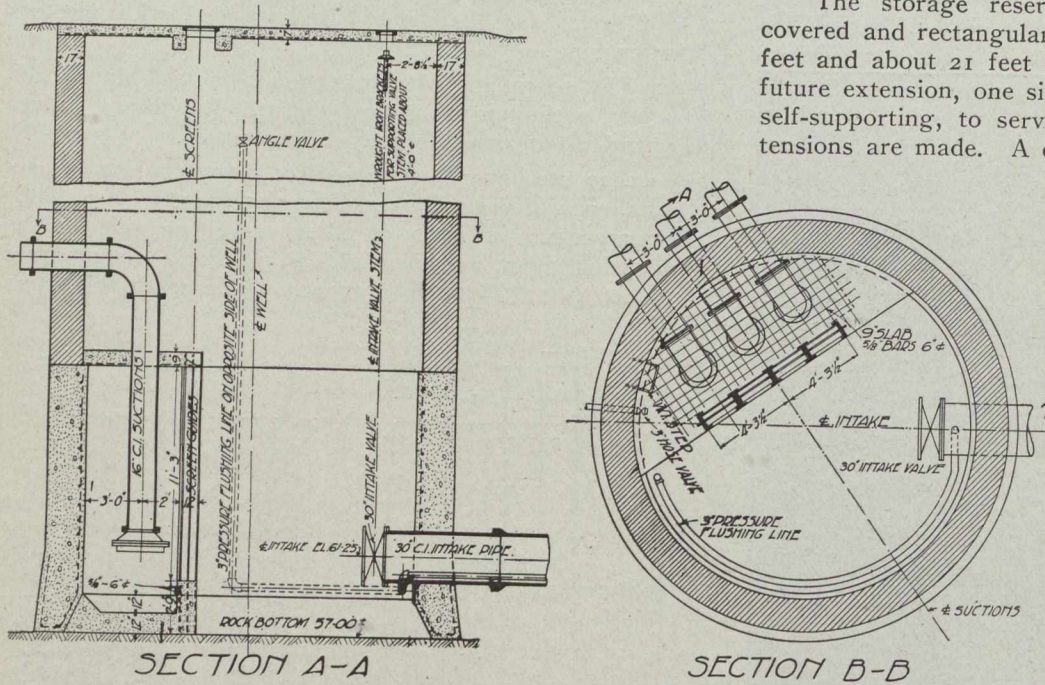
Sectional Diagrams of Suction Well, Showing Piping Arrangement.
